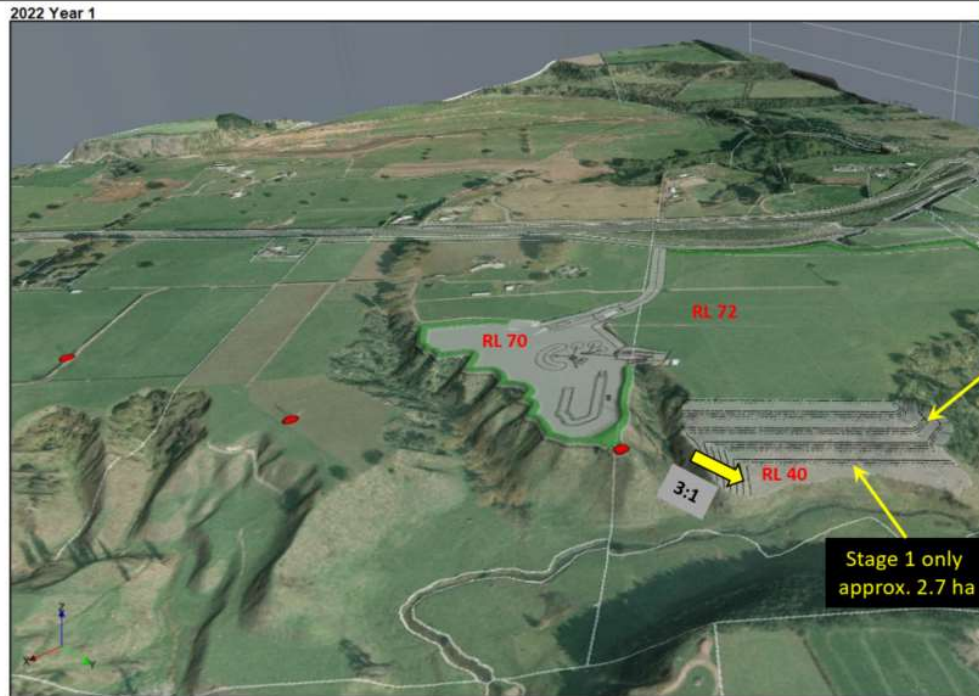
Proposed Lowest Quarry Floor Level RL 40m (plan from 30 June 2022).
